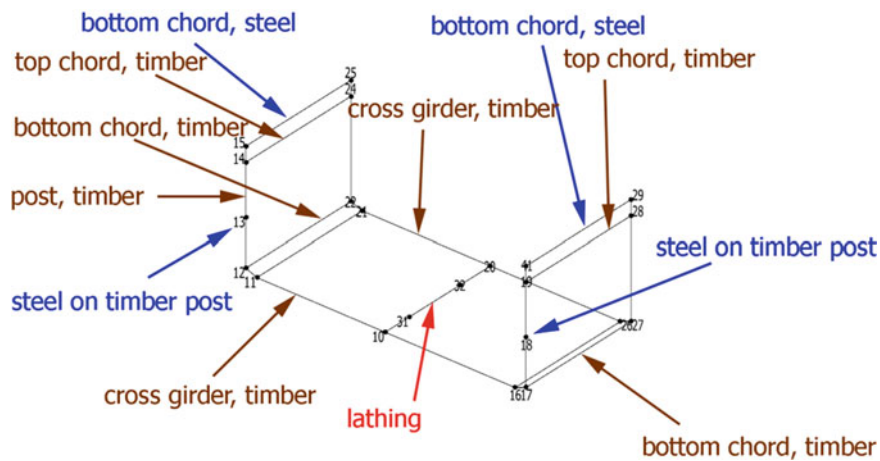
Details of the roof structural elements. Blue: steel, brown: timber, red: lathing
